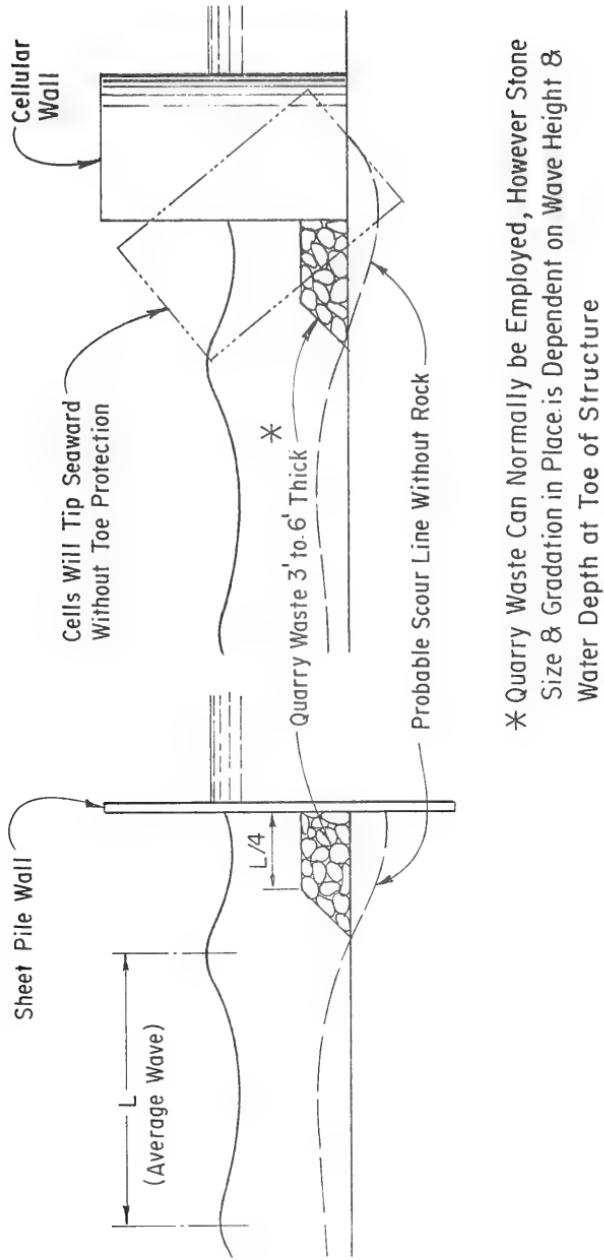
Use of toe stone to prevent wave scour at the base of vertical walls.
